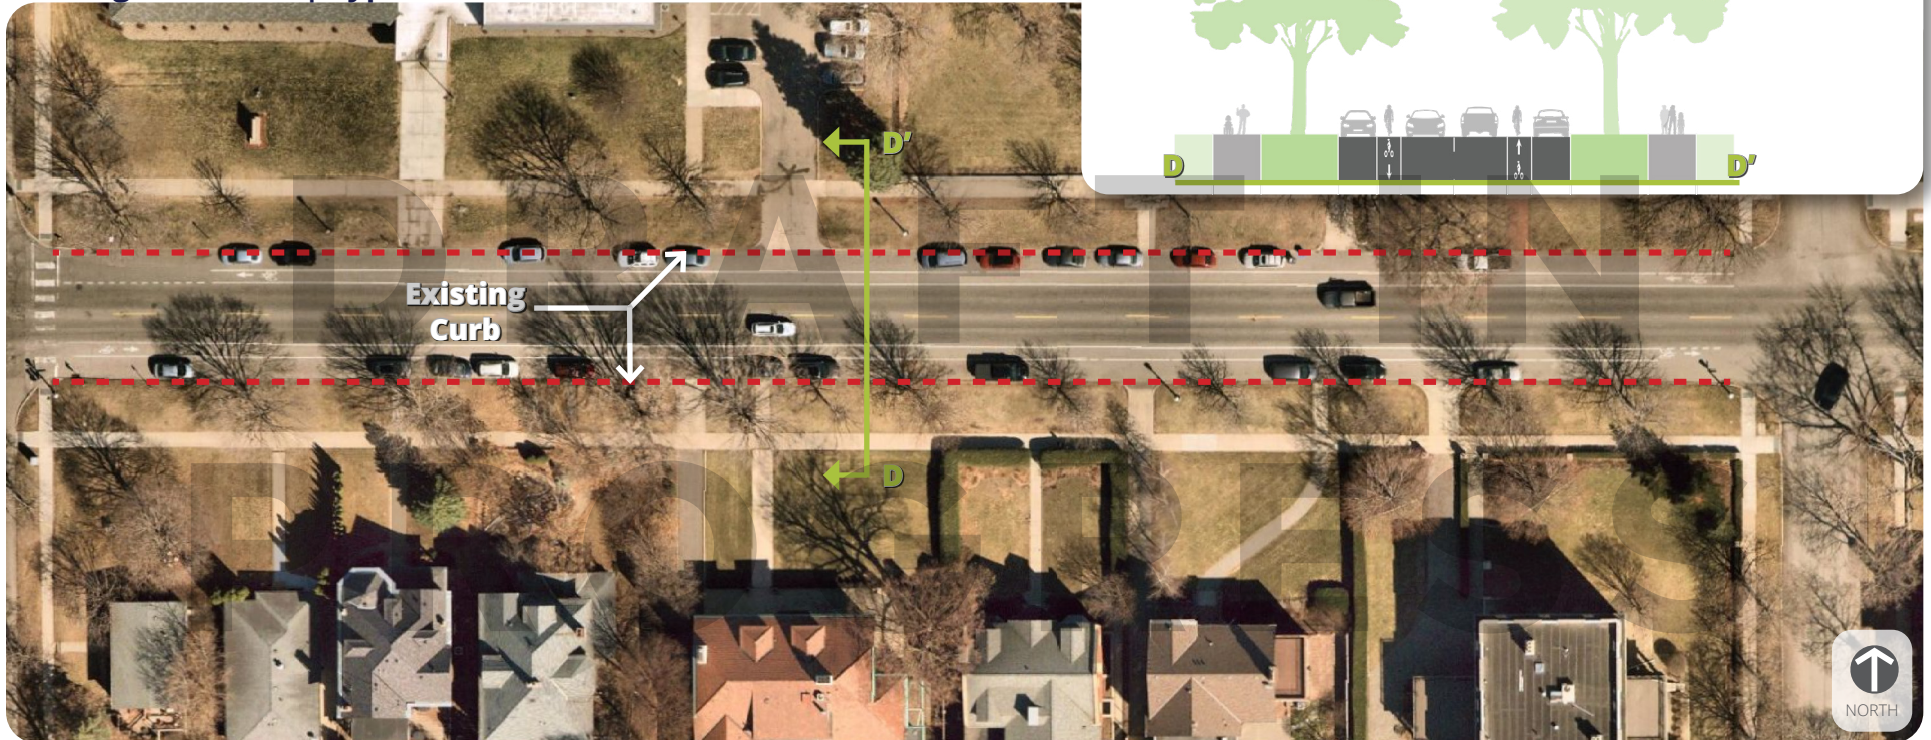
| Segment D, E, F - Existing Condition - Typical Block
